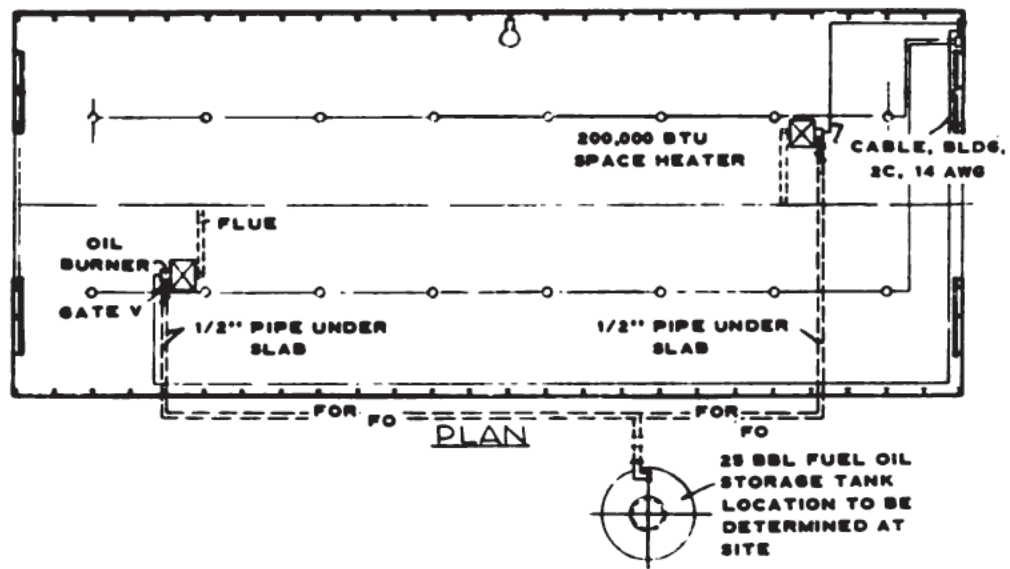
Heater arrangement of 40- by 100-foot arch rib building.
